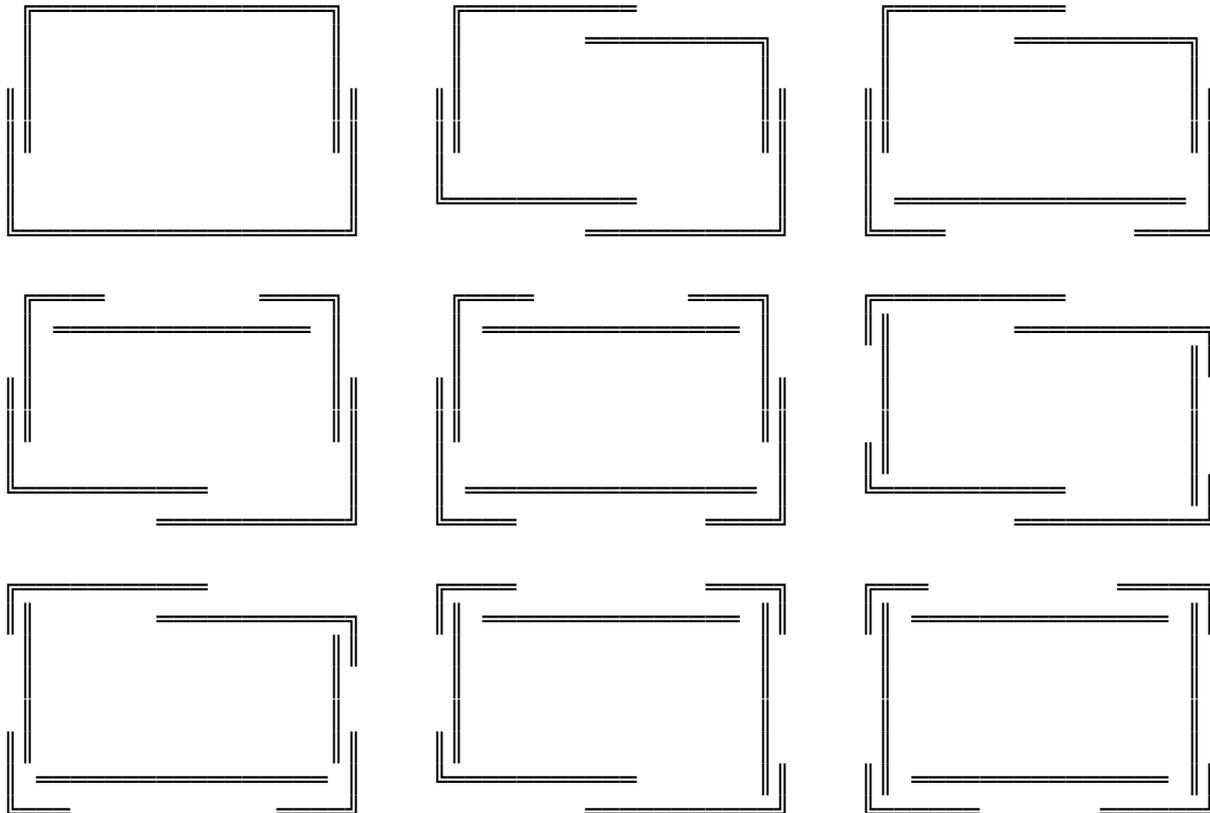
EXTERNAL FACE REINFORCEMENT
